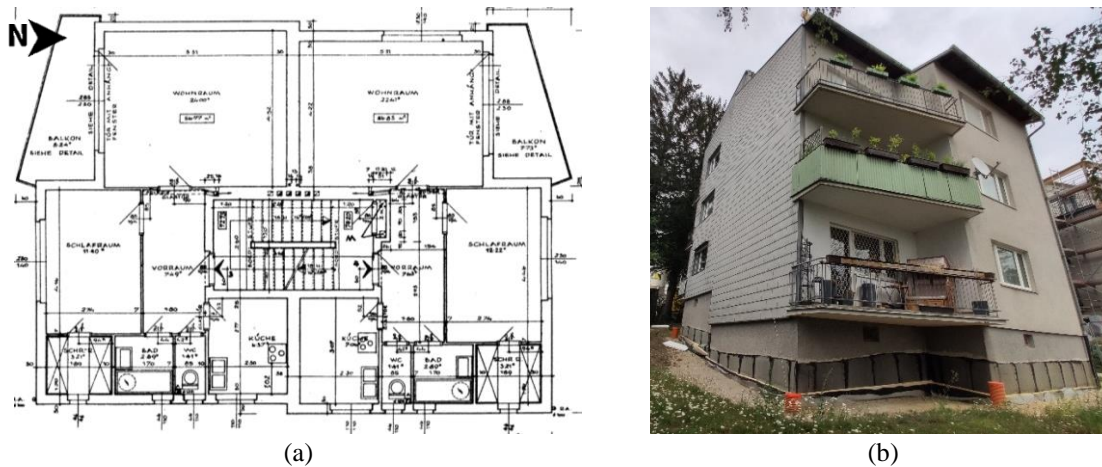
(a) Floor plan; (b) Picture of the southwest side of the building.
